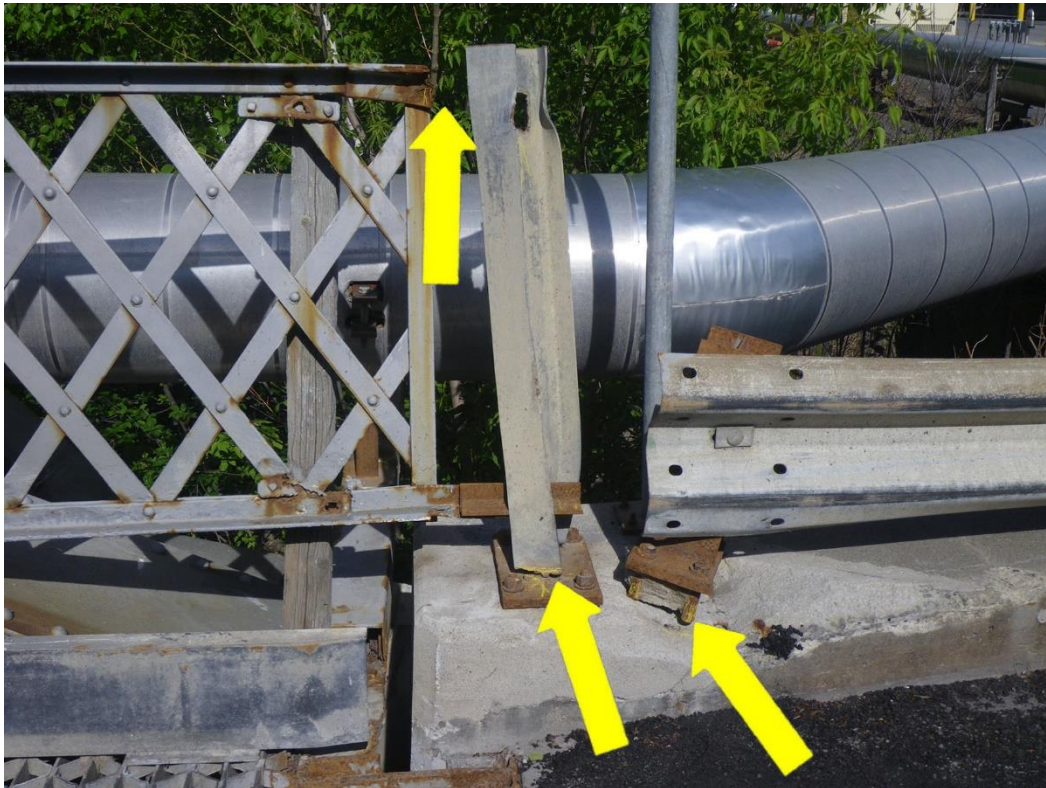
SE Bridge Railing Transition, Looking East - Tall rail post with warping, bent flanges, full width fracture in both flanges along the base plate, partially connected to bridge railing and not connected to guardrail. Note guardrail rail post with debonded/pulled out anchor bolts.
